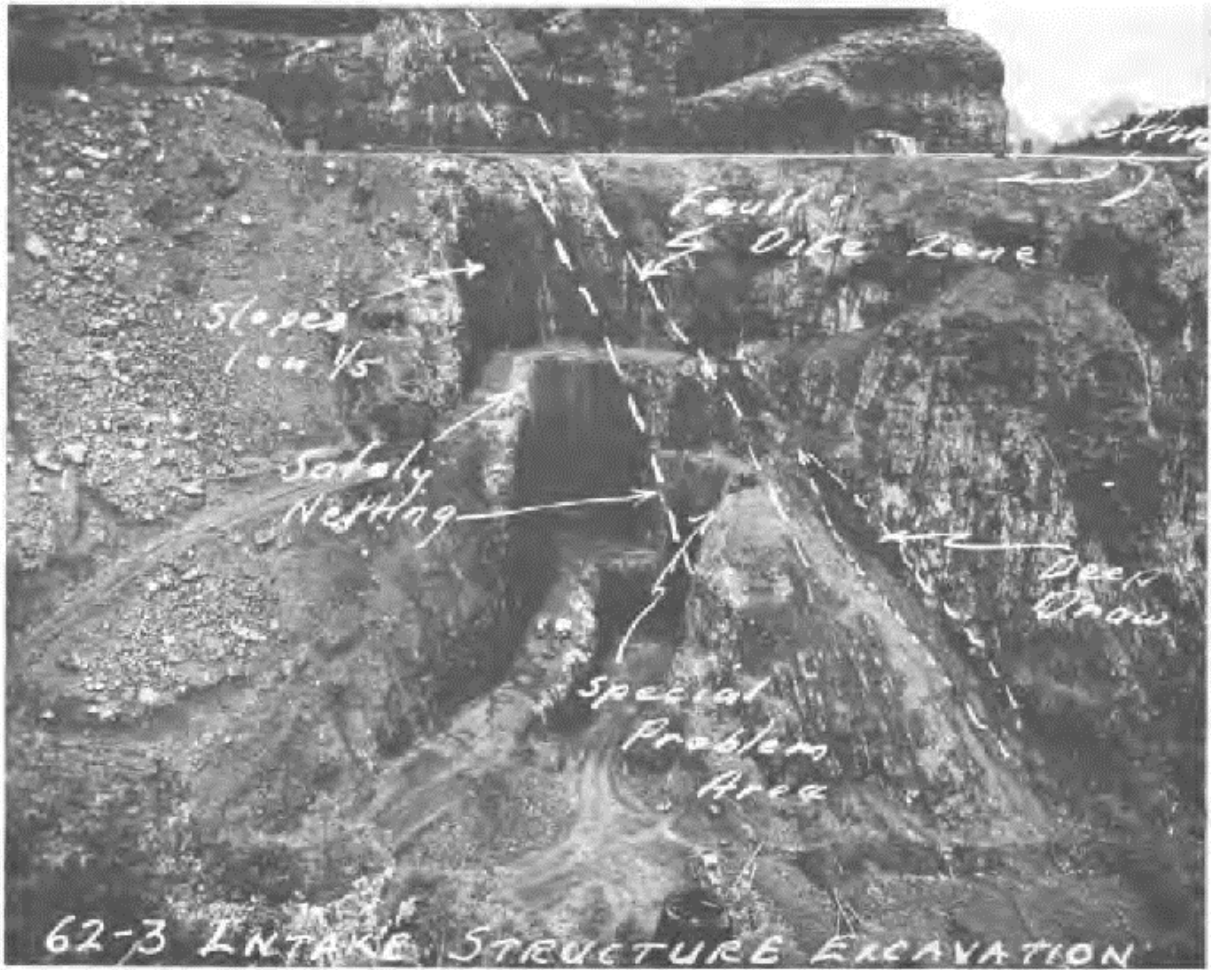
Extent of the Fault and Dike Zone Uncovered During Intake Excavation
